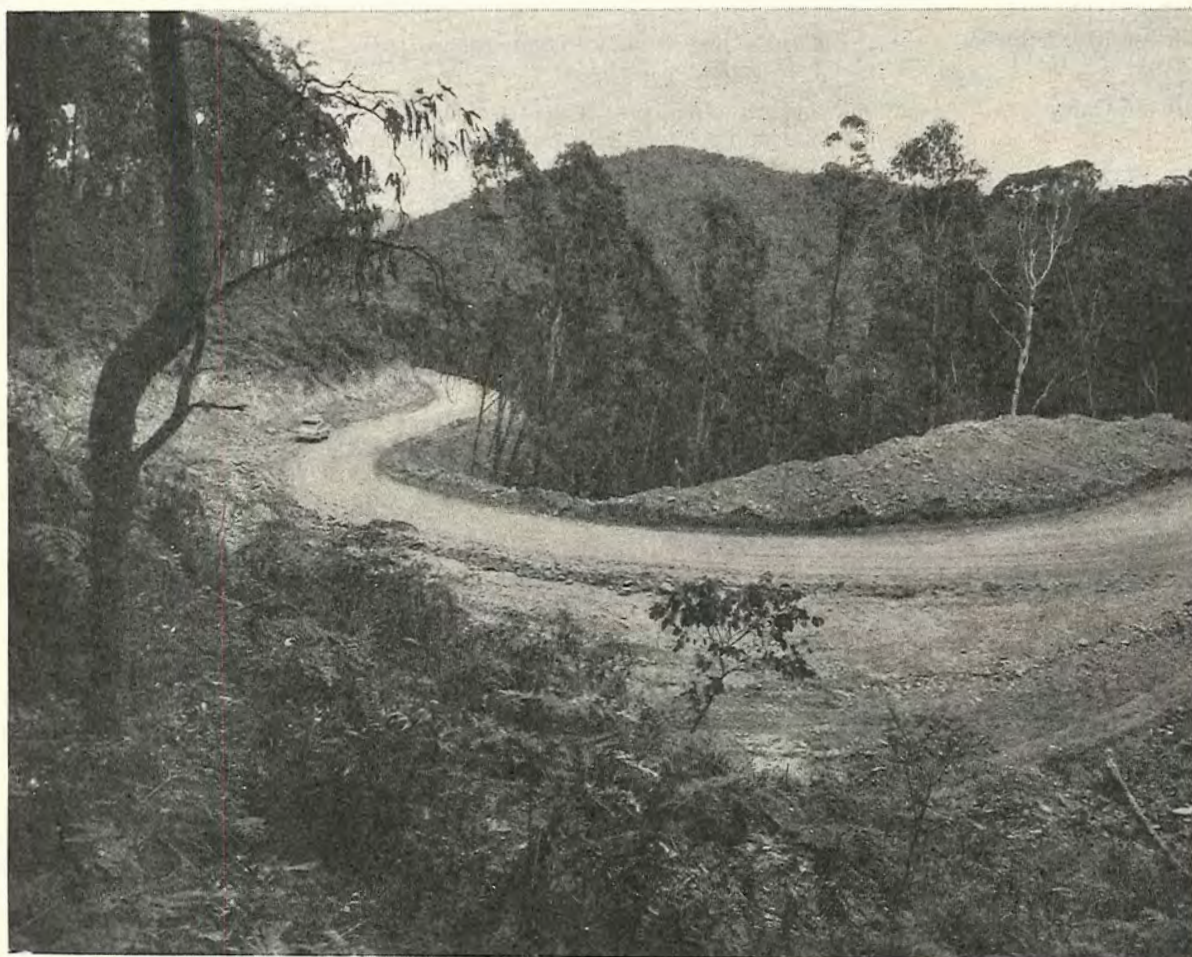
Reconstructed section of the Bright-Tawonga Road—Shire of Bright.
